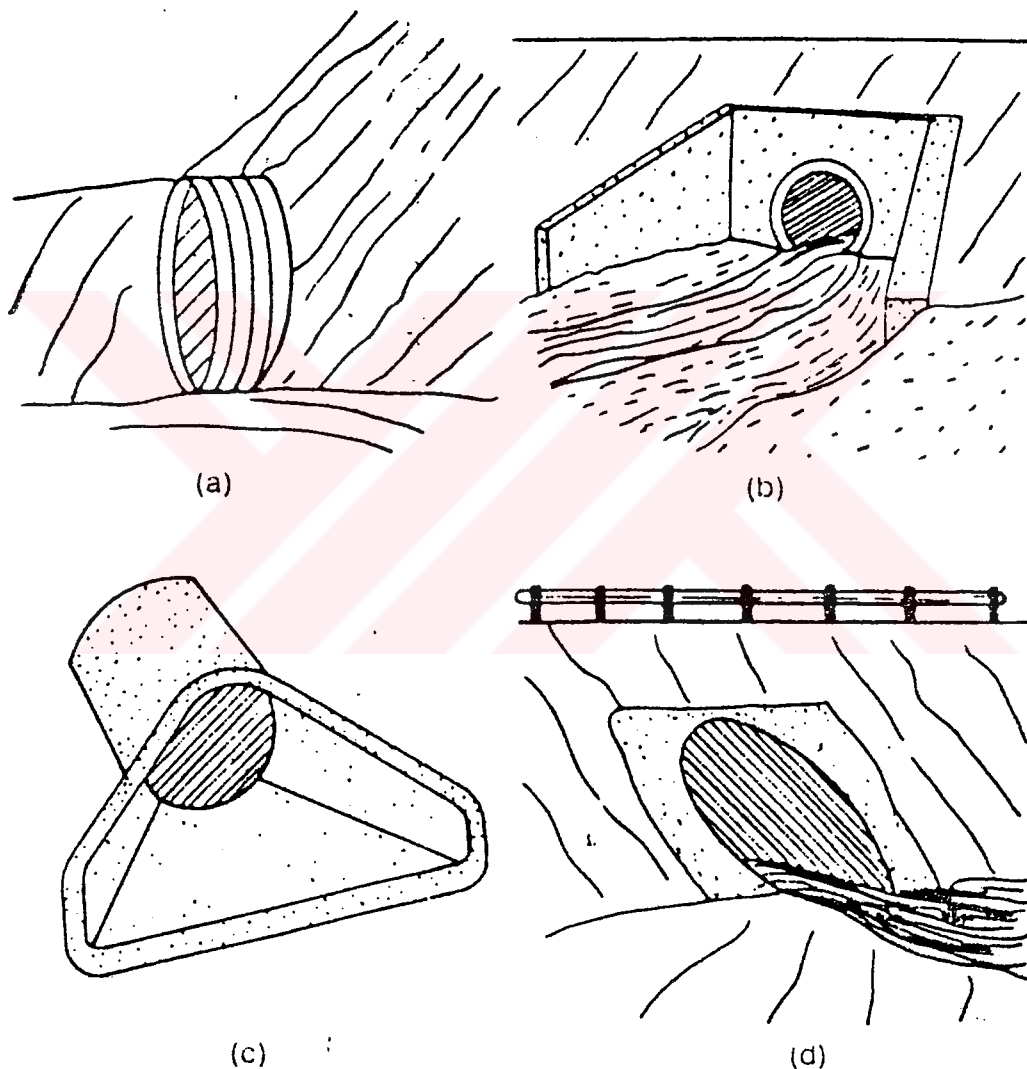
Four standard inlet types (schematic): (a) projecting barrel, (b) cast-in-place concrete headwall and wingwalls, (c) precast end section, and (d) end mitered to the slope (ASCE, 1985)
